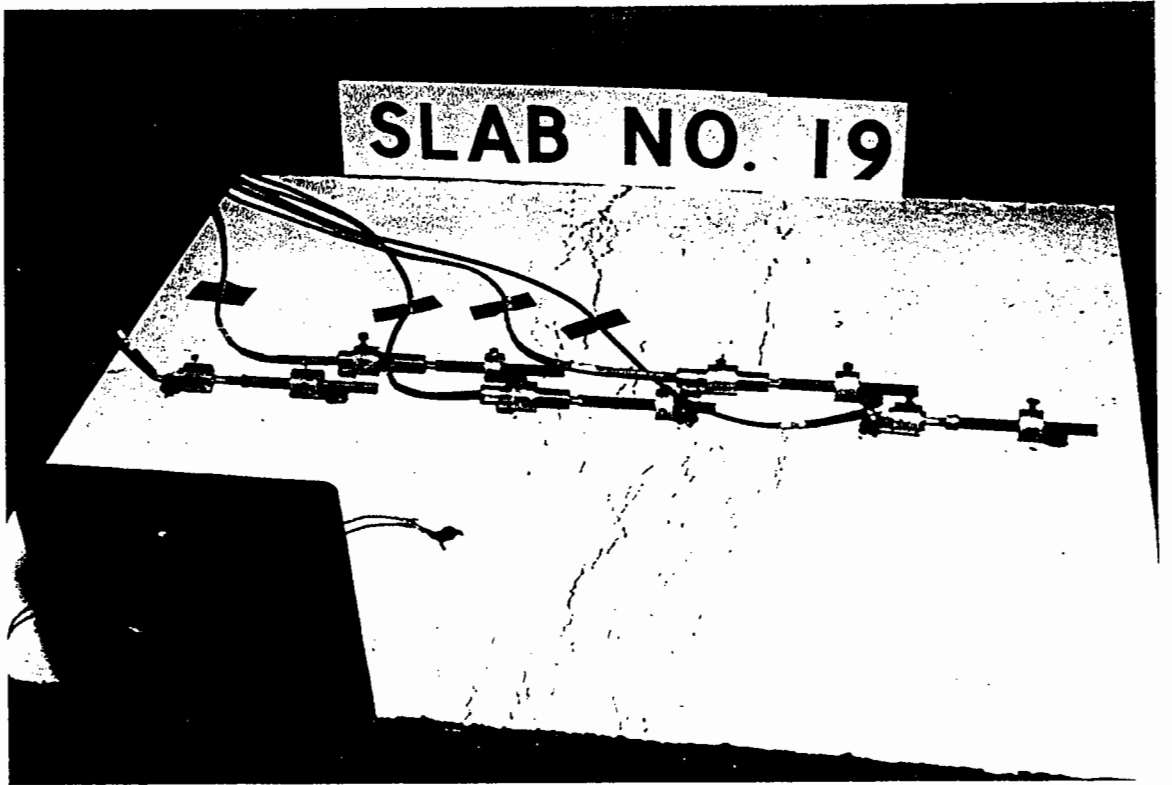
SPECIMEN NO. H/2/20T AFTER 19
